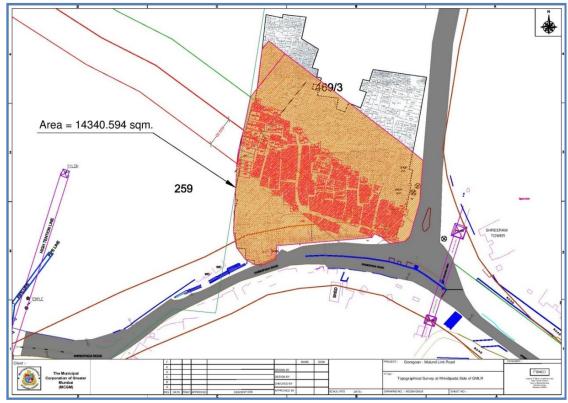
Structure affected on Khindipada side Amar Nagar Slums Tunnel East side approach Road
